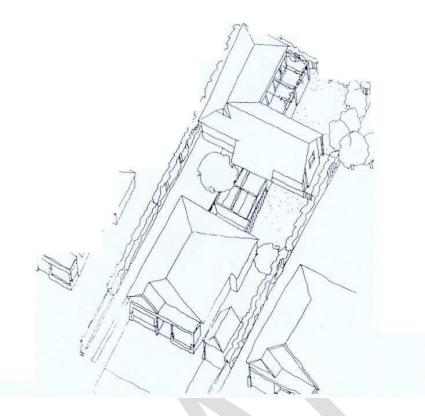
NEW DEVELOPMENT SHOULD ALWAYS ADDRESS THE STREET FRONTAGE
